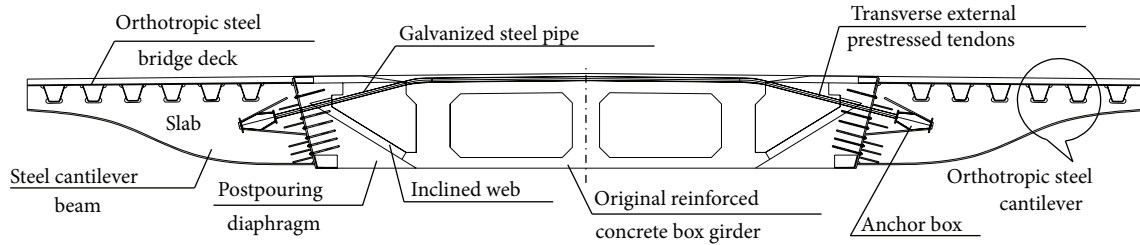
Sectional drawing of original box girder widened by steel cantilevers.
